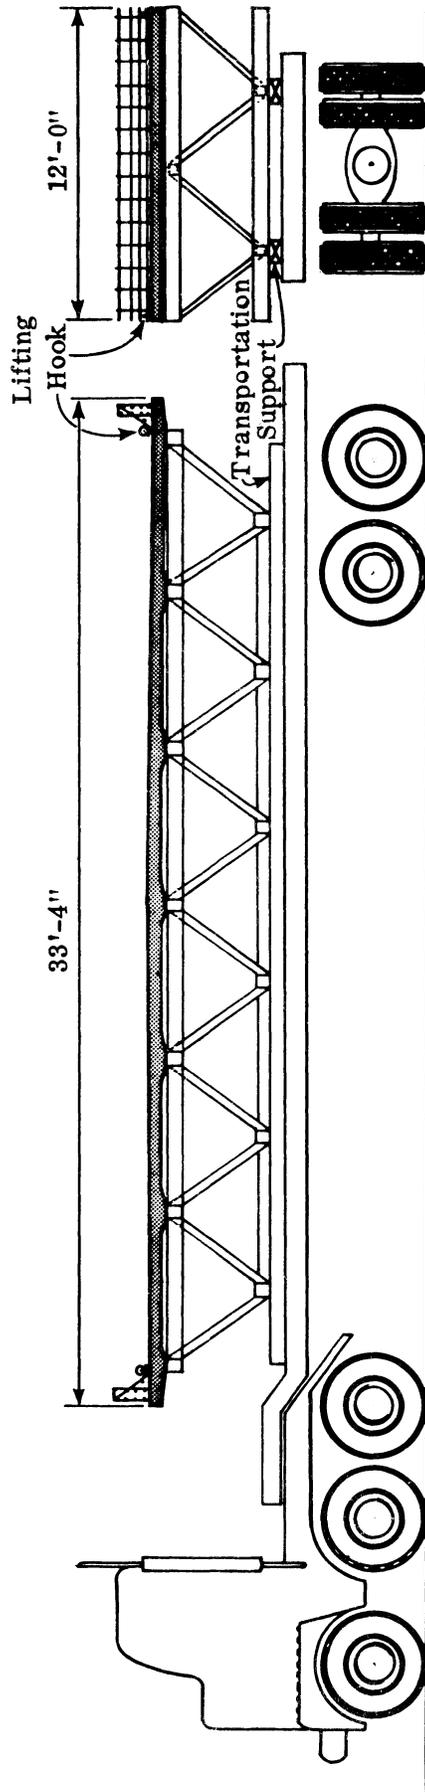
Hauling arrangement for 12' - 0" (3.66 m) sections
